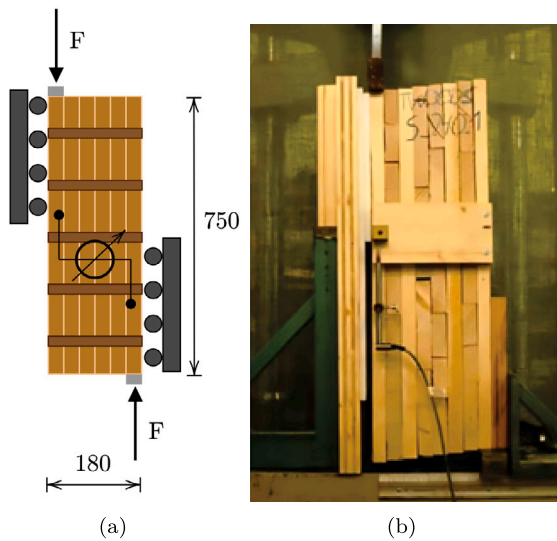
(a) Experimental setup of the push-out tests (b) View of the push-out specimens after the tests.
